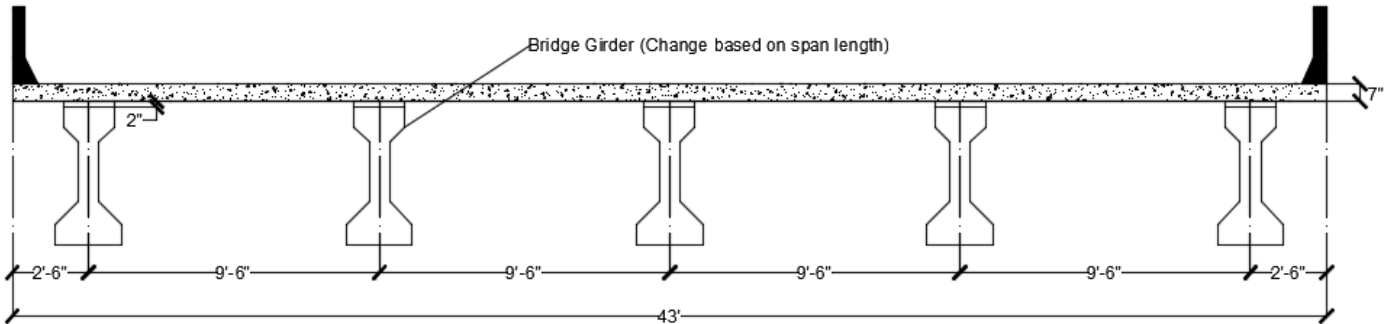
Cross Section of the Typical Superstructure of Highway Bridge
